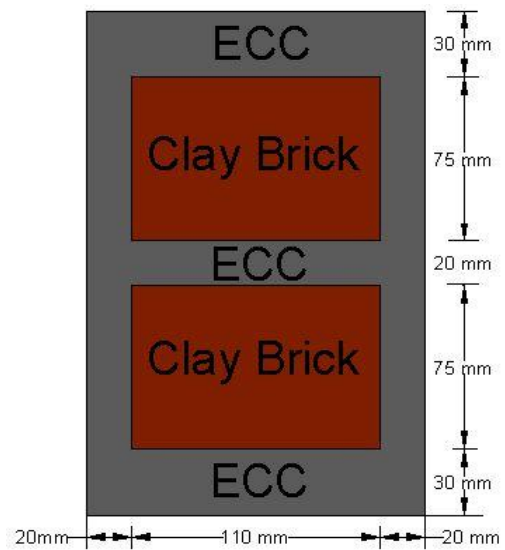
(b) Cross-section of masonry beam with ECC as bed
